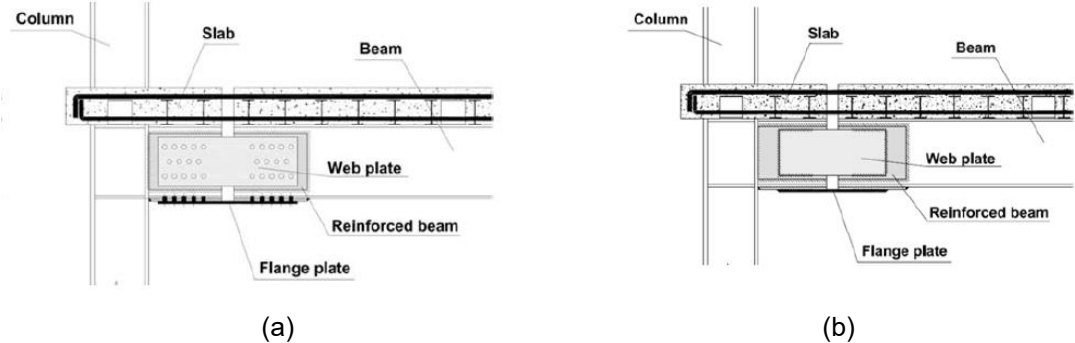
FUSEIS2 system: (a) bolted beam splice (b) welded beam splice.
